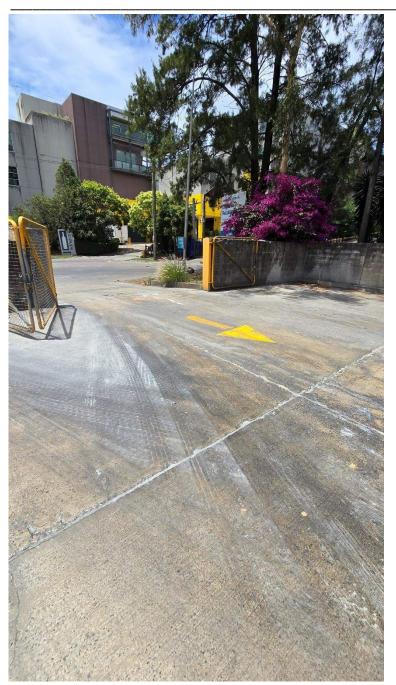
Cracks observed (40, 41, 42, 43, 44) - Concrete cracks throughout area
